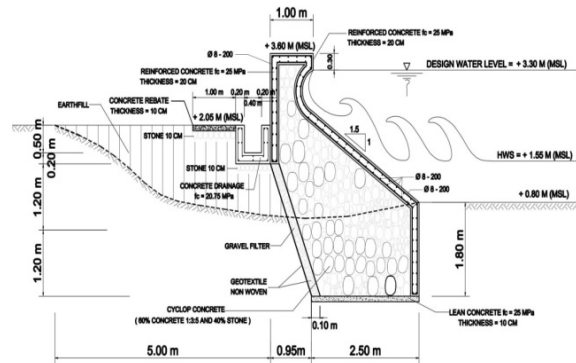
Seawall design for the location denoted as observation point 6 in Pantai Harapan Village.
